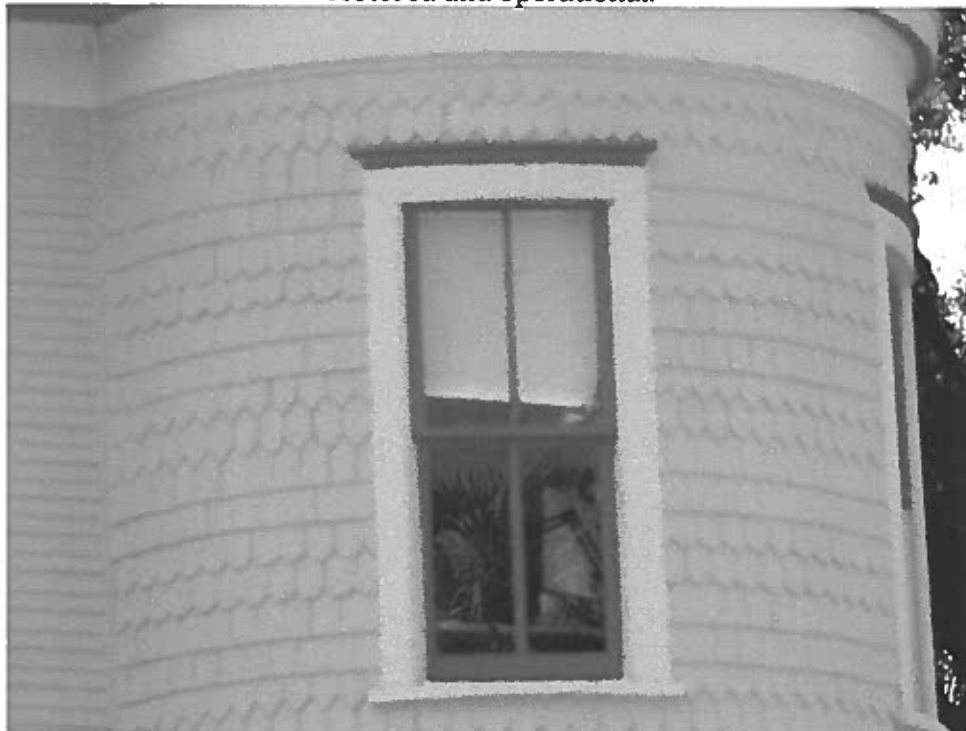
East facing window to the 2<sup>nd</sup> floor southeast bedroom.
